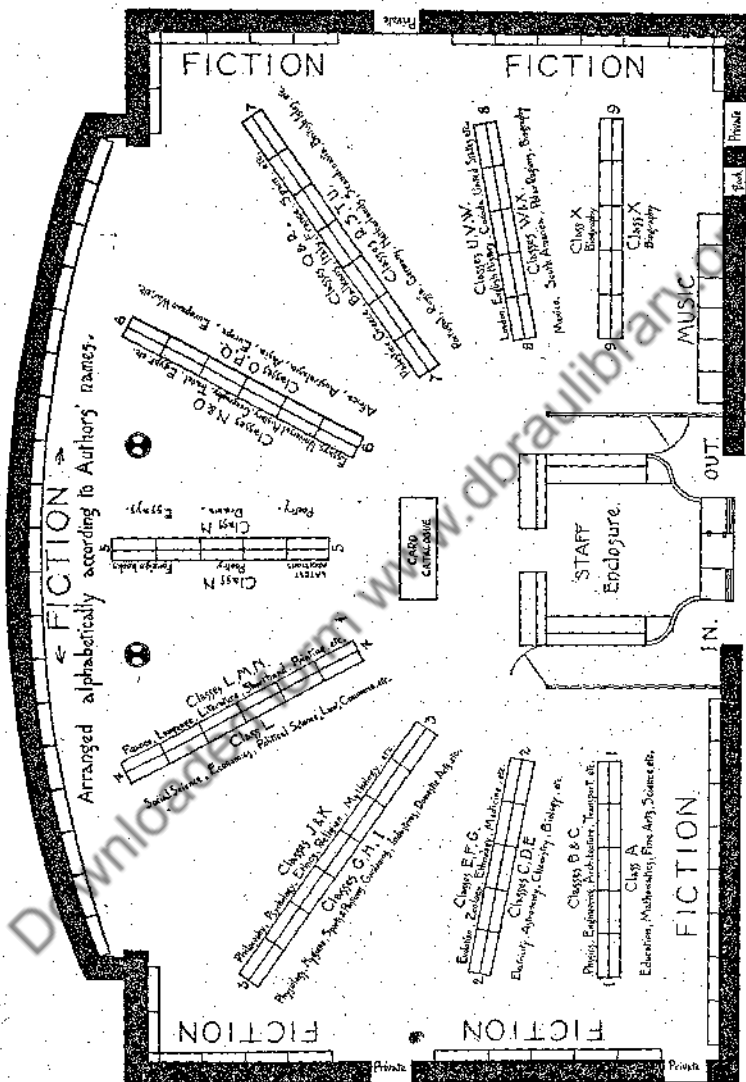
Bethnal Green Public Library: Plan of Ground Floor.
